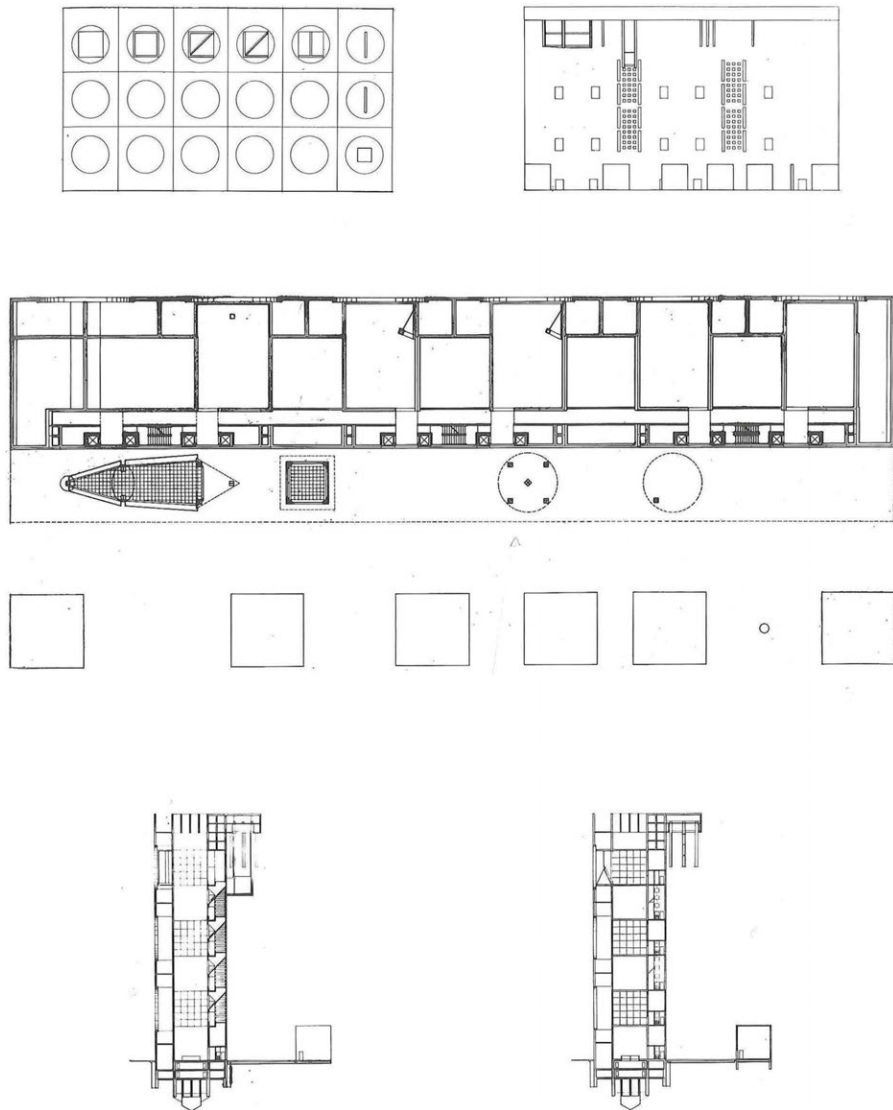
Franco Purini, 'Progetto di un edificio lamellare' [Design for a lamellar building] (1968). From top to bottom: rear and front façades; plan at the level of the hanging structures; cross sections.
